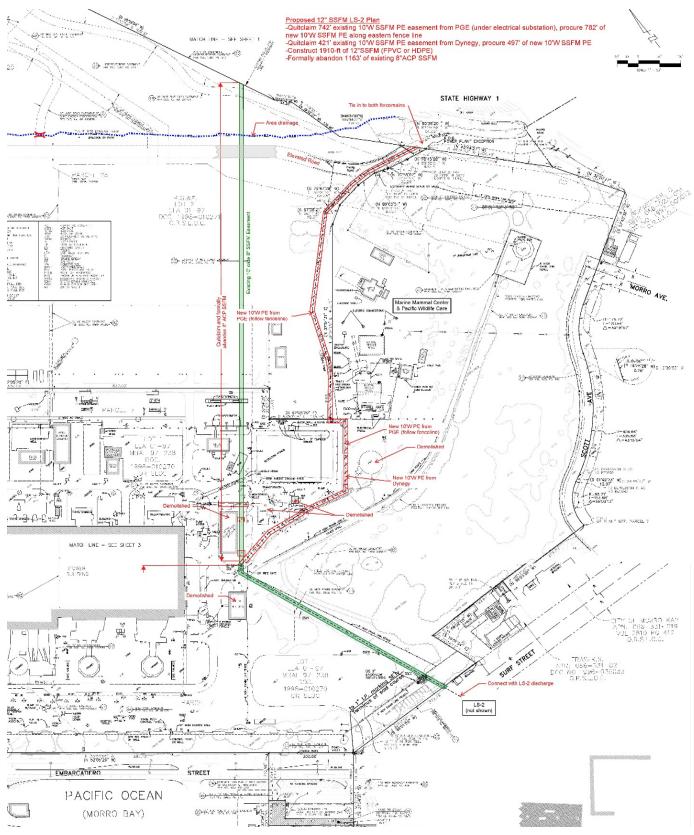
Existing 8" LS-2 Diversion and Replacement (Presented in greater detail in Appendix A)
